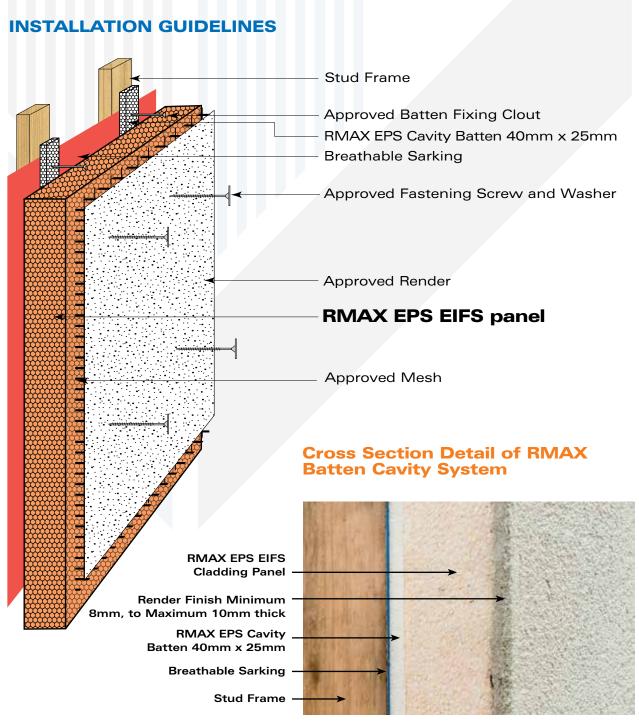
Cross section of complete RMAX Batten Cavity EIFS Cladding System.
